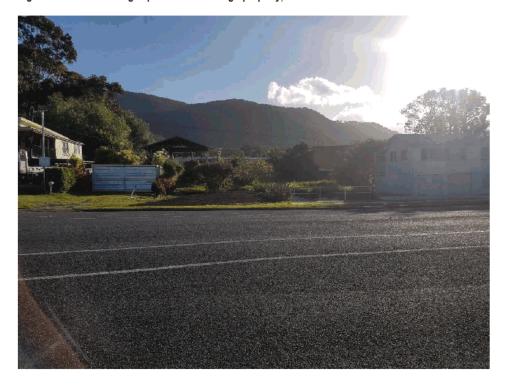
Trunk drainage culvert discharging to open channel next to development, Laurieton
